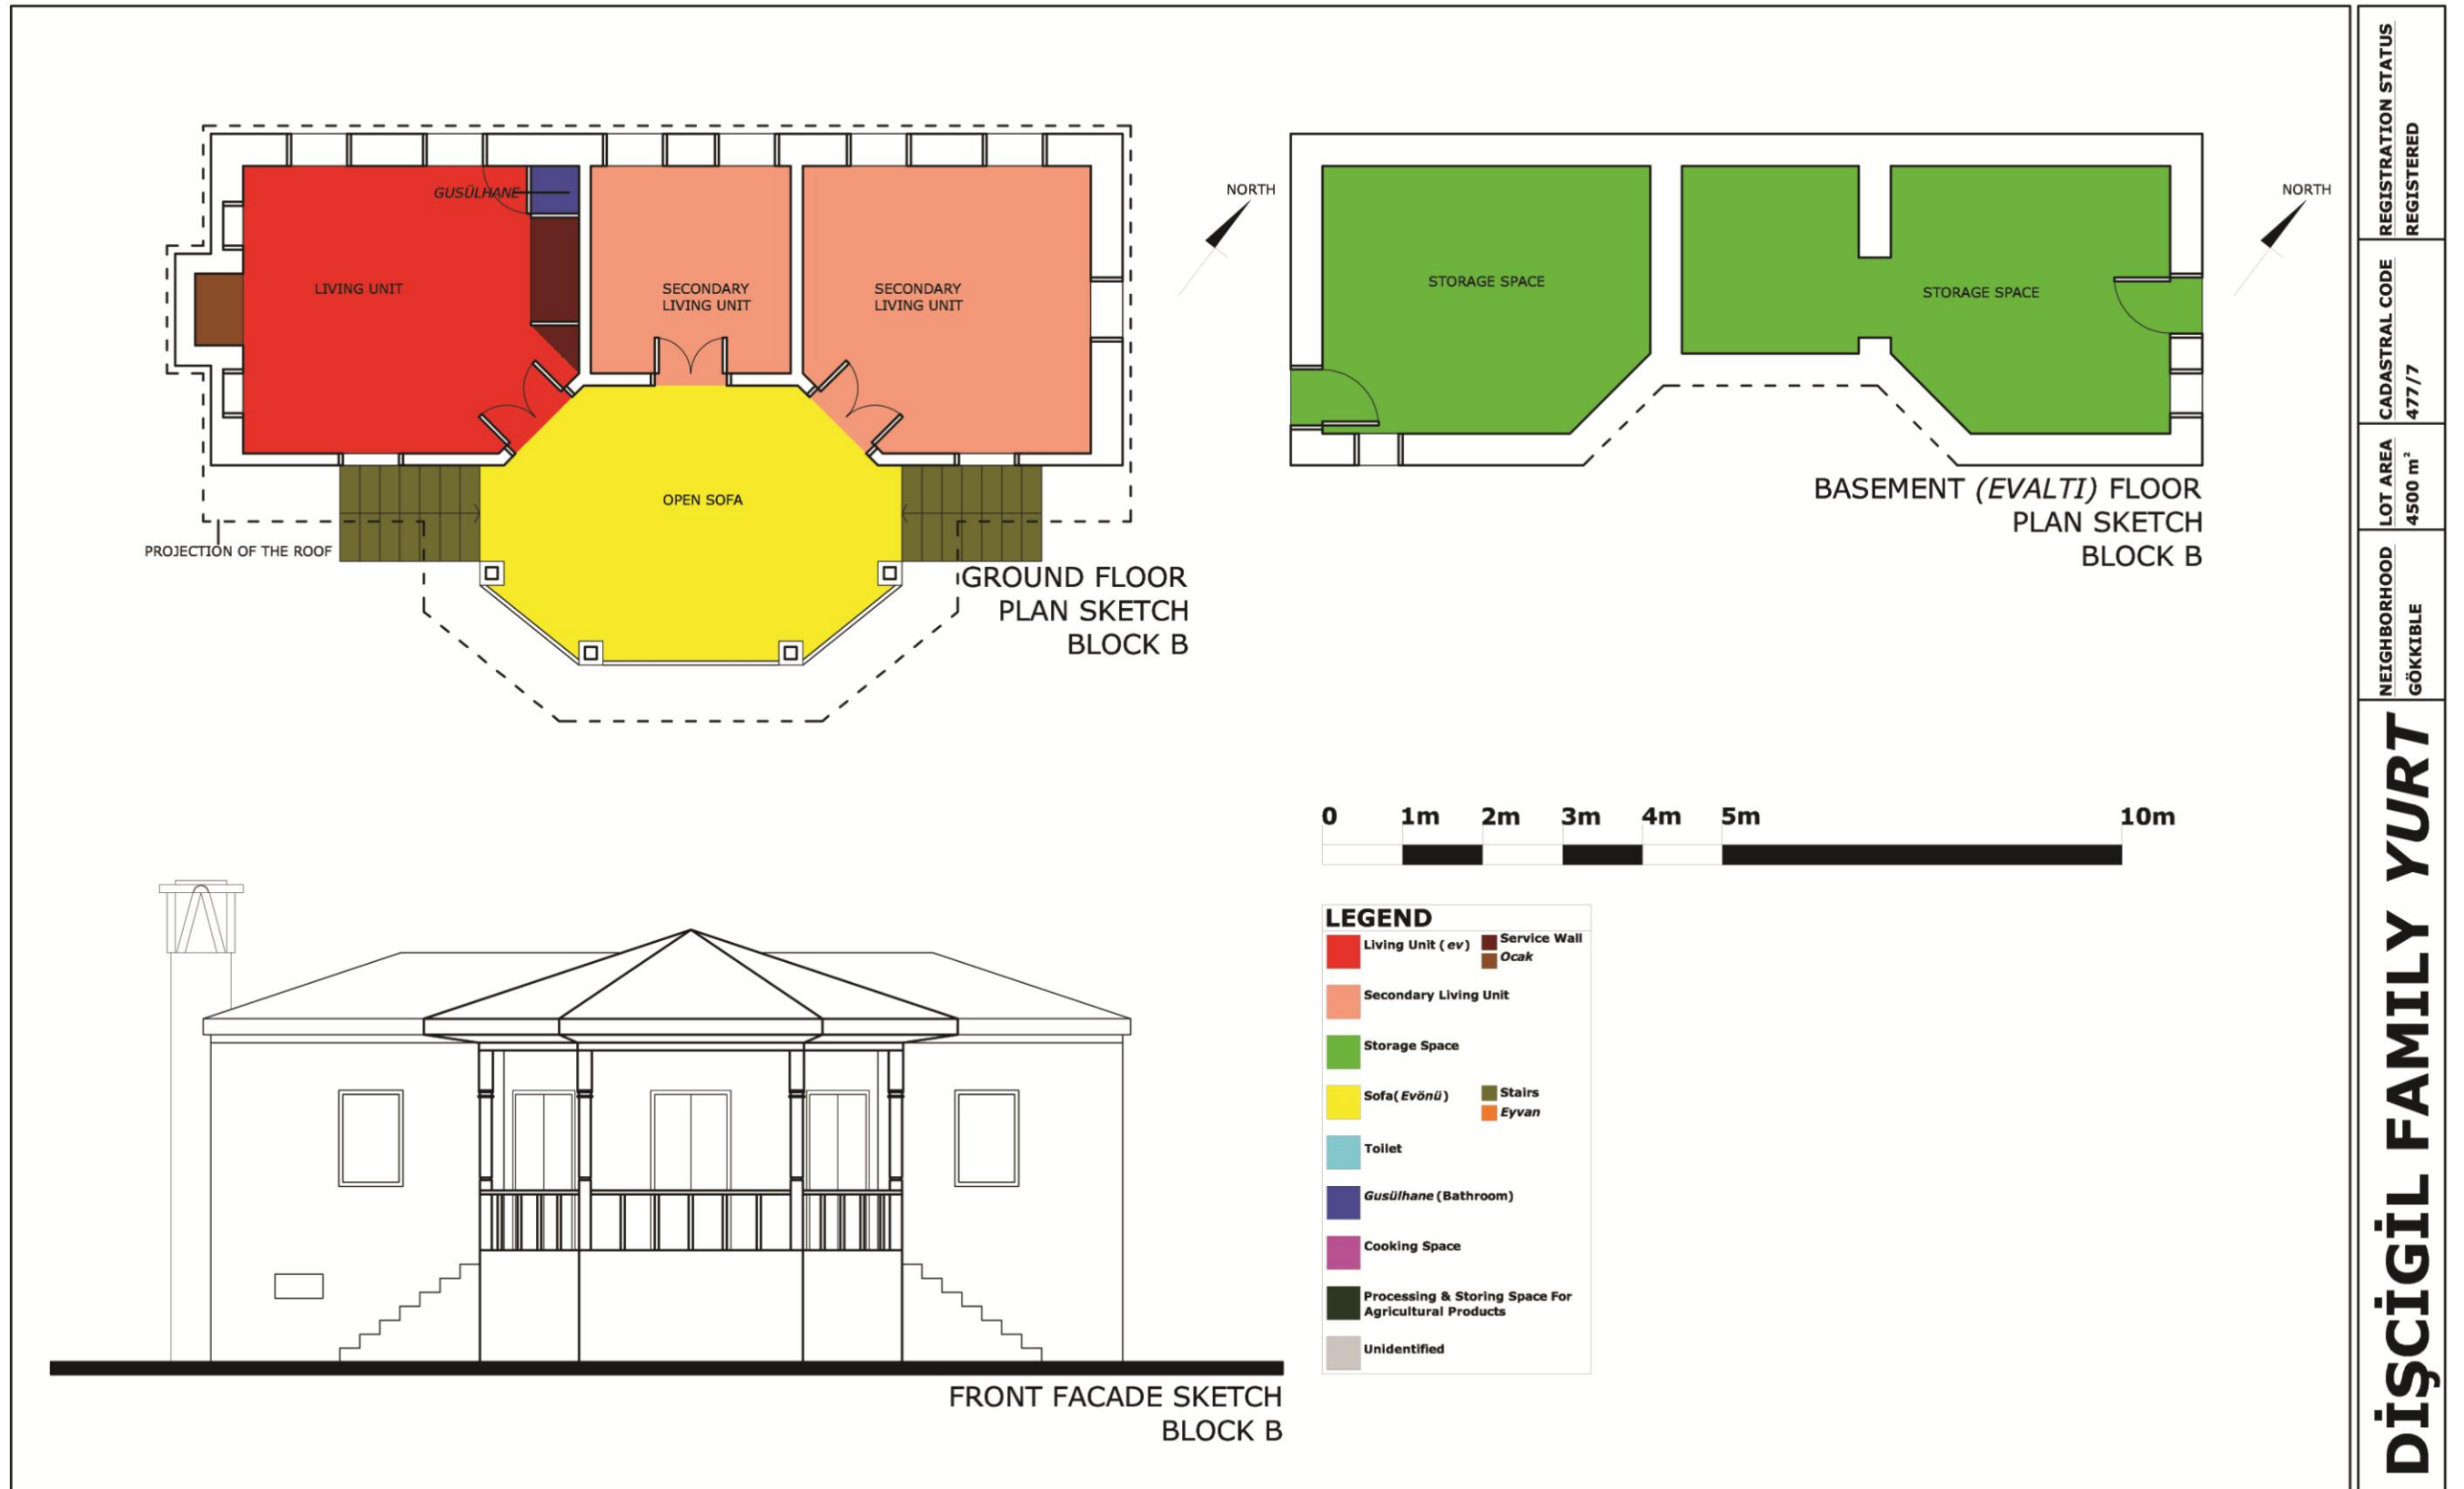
Plan and front façade sketches of Block B in the *yurt* of Dişçigil Family
